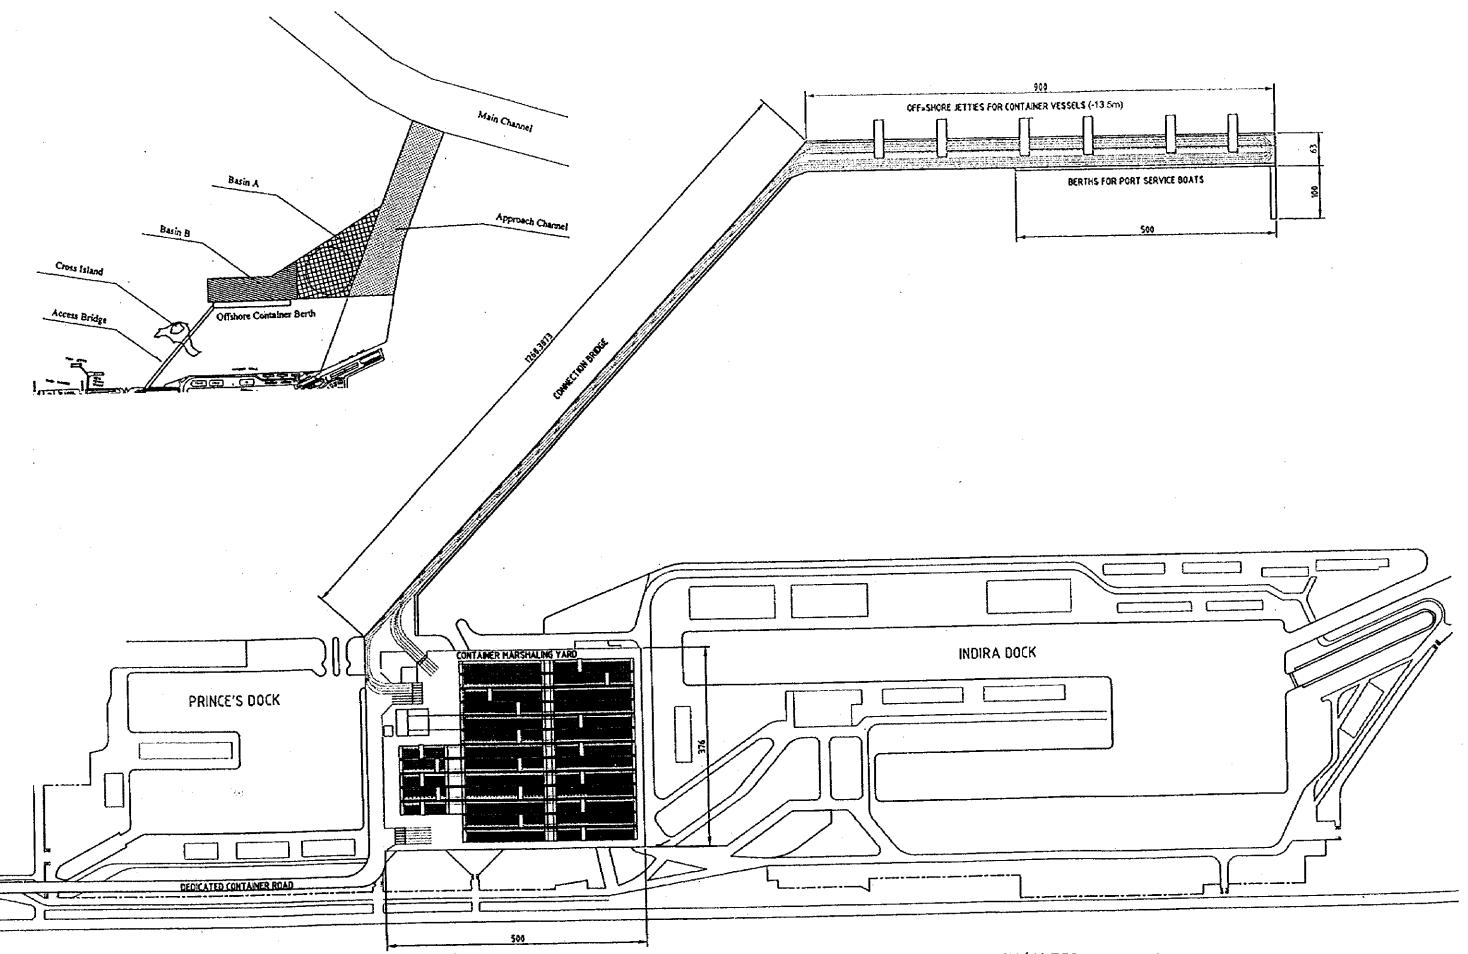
(2) LAYOUT PLAN OF A NEW CONTAINER TERMINAL AT VICTORIA DOCK (ALTERNATIVE-6) SCALE1:7,000
